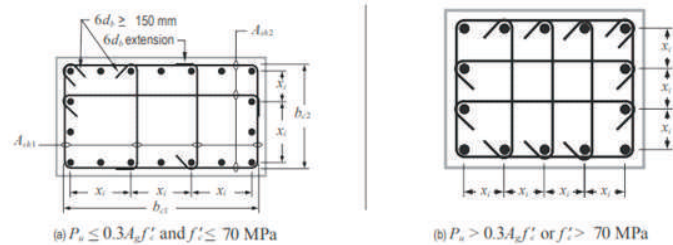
Column transverse reinforcement detail as per ACI 318 Clause 18.7.5.2 (Source: Moehle and Hopper, 2016)
